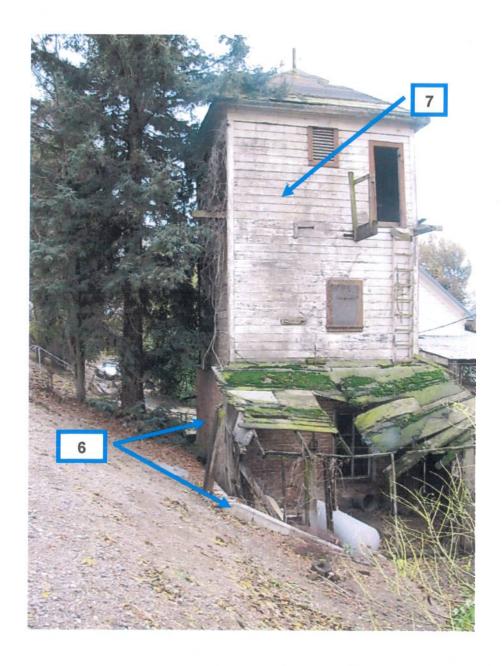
Site visit photos for APN 162-160-03 Dan Roza, T2012110 (source: CVFPB staff site visit on December 6, 2012)
